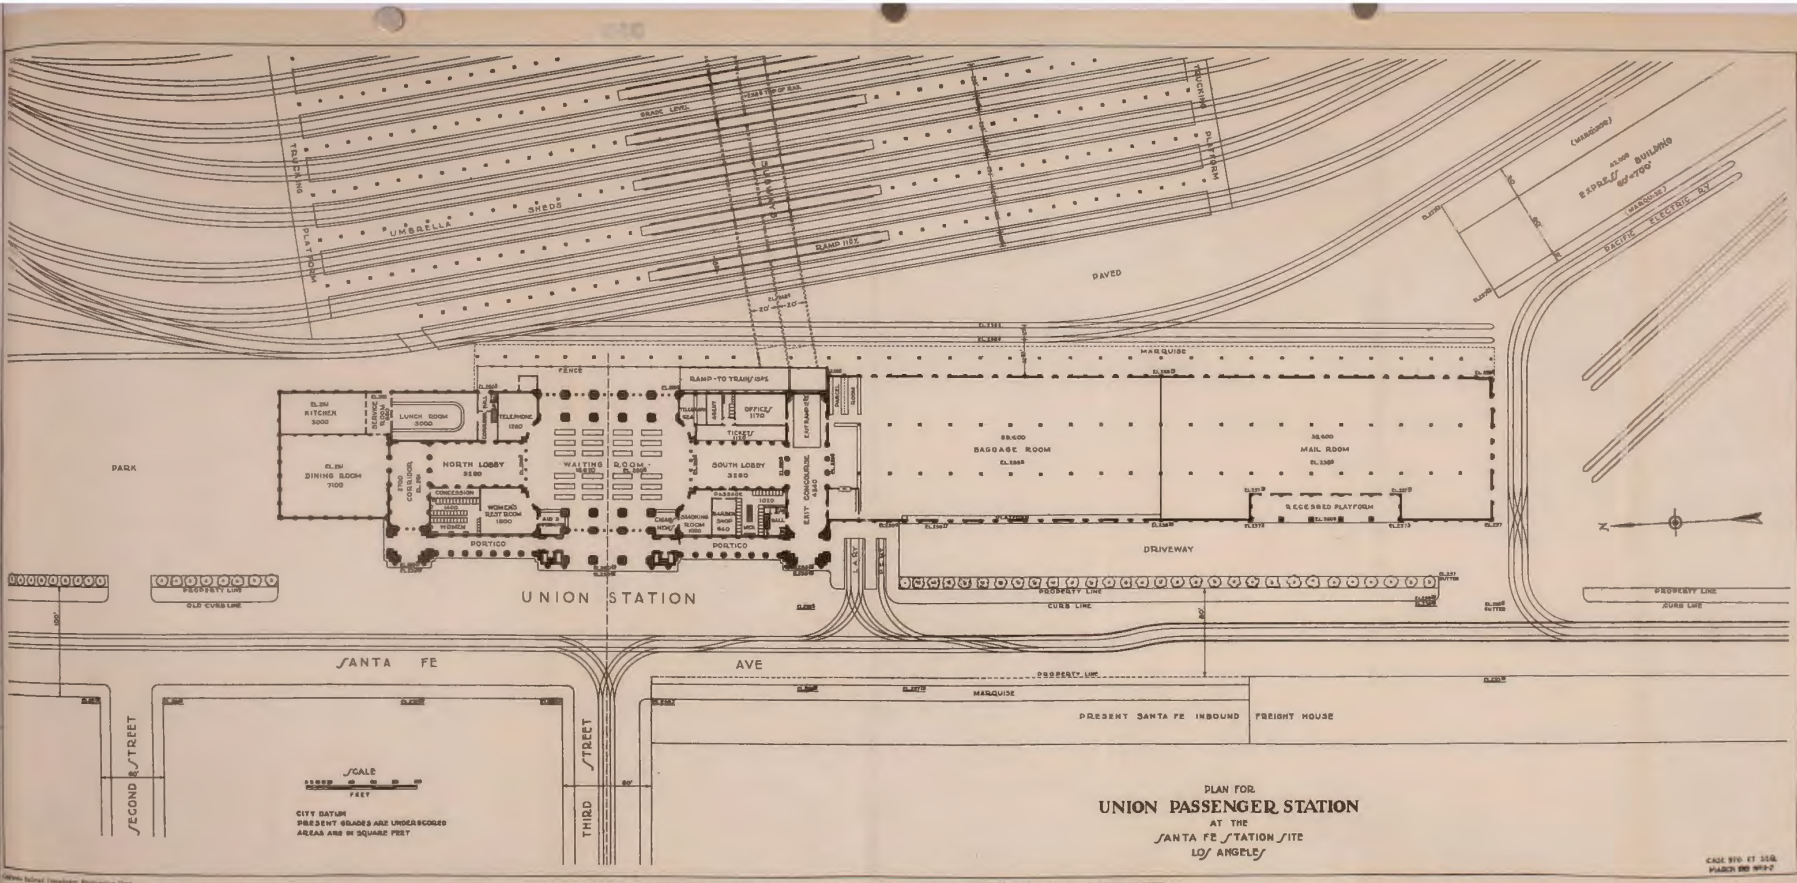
ENGINEERING DEPARTMENT PLAN FOR UNION PASSENGER STATION AT THE SANTA FE STATION SITE
